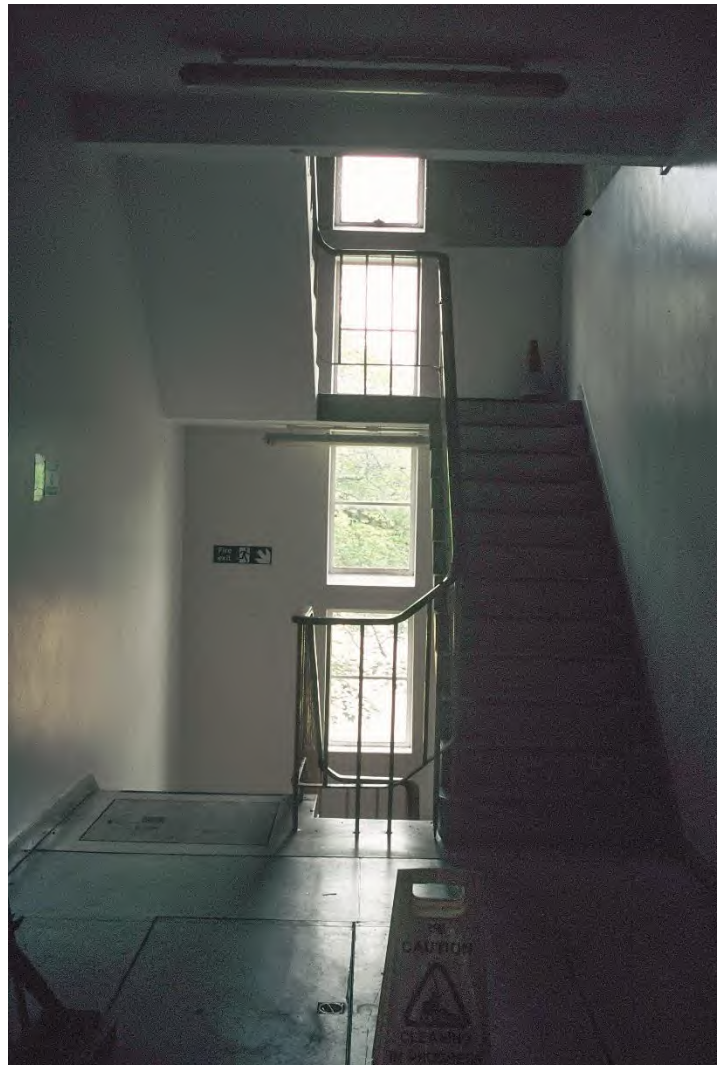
Block A: Interior First Floor Stairs (Swinden5_04) Facing North.
